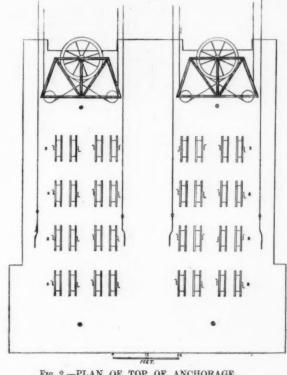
PLAN OF TOP OF ANCHORAGE.
